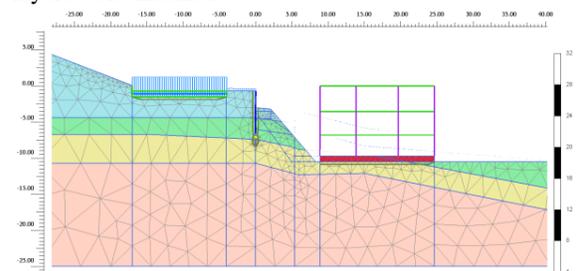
Numerical model view of the excavation at an intermediate construction stage
